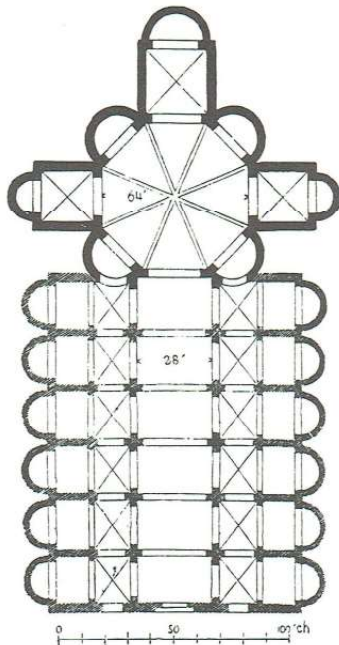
Plan of Santa Maria della Passione at Milan as it is in the present
